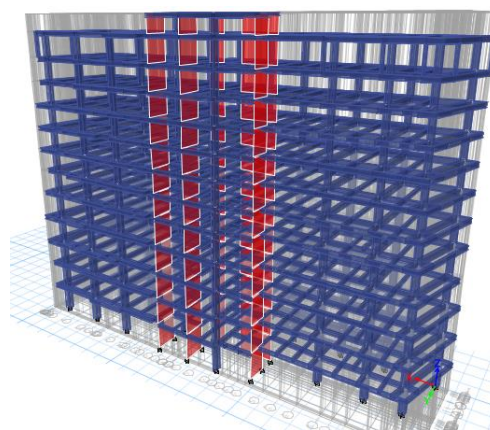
3-D modeling structure MRT Hub Dukuh Atas Jakarta
